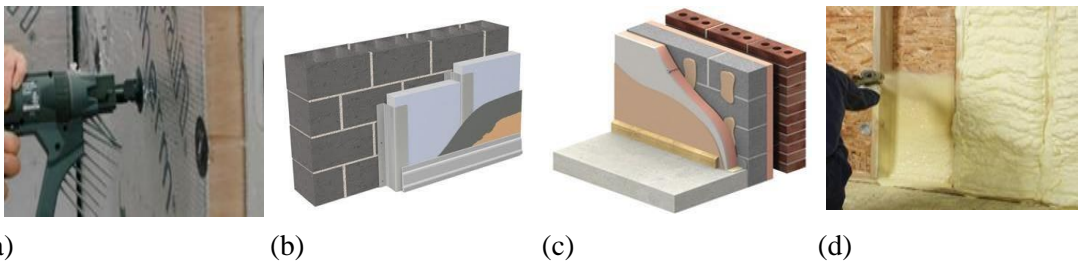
Methods for installing wall insulation. (a) Fixing insulation with nails using gun, (b) Fixing insulation using furring Z-channels, (c) Fixing insulation with adhesives, (d) foamed-in-place.
